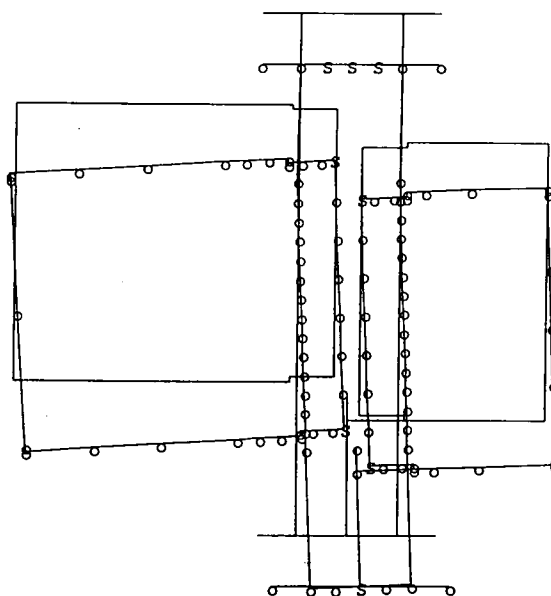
Deformed structure at floor beam connection due to a 3S2 truck - west bound middle lane
